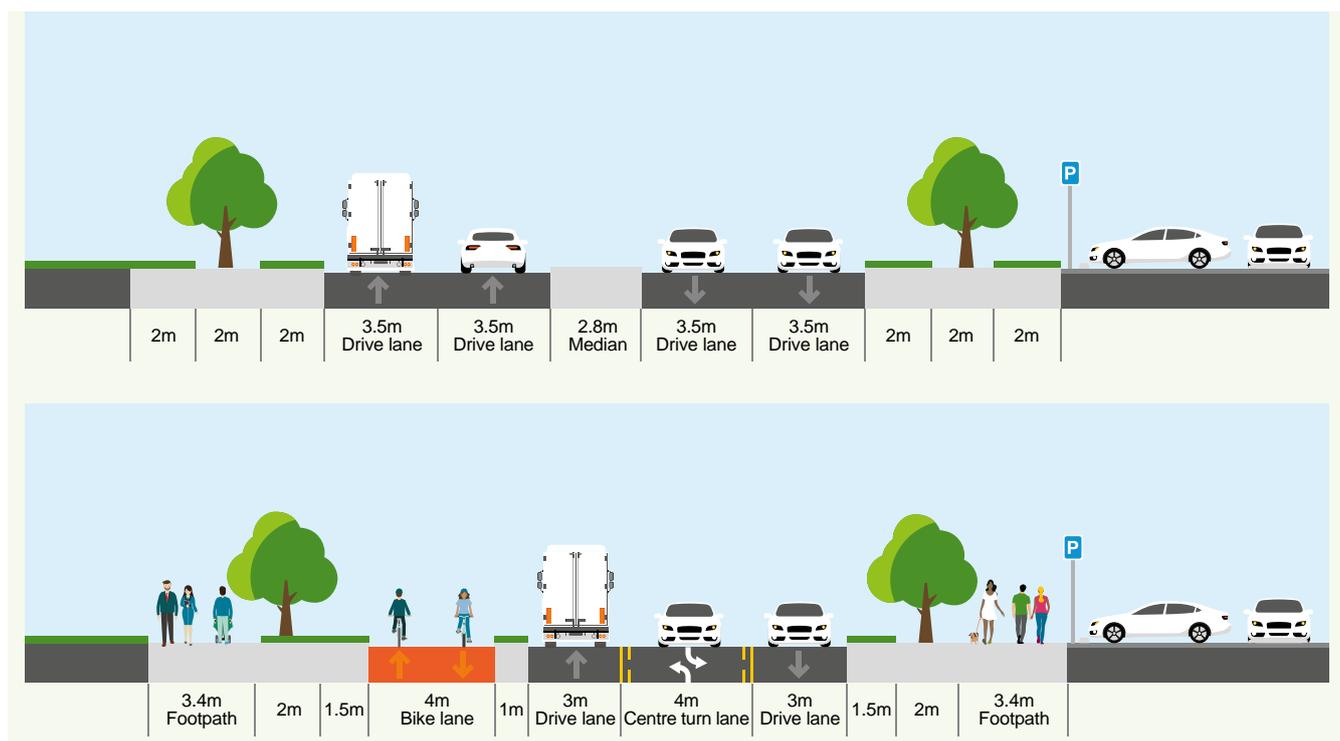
'Road diet' principles can be used to re-allocate road space to cycling infrastructure.
